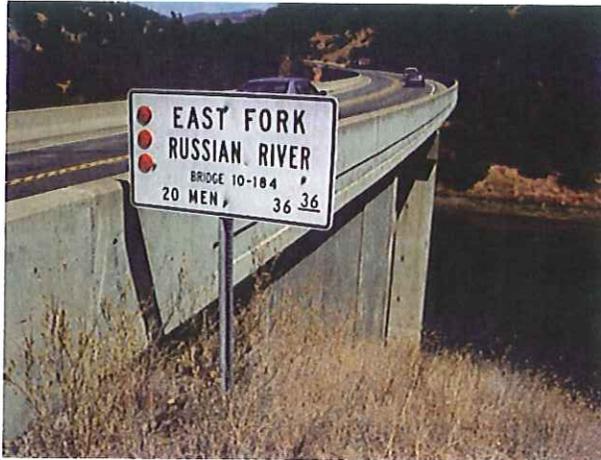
East Fork Russian River Bridge (Bridge 10-0184)
